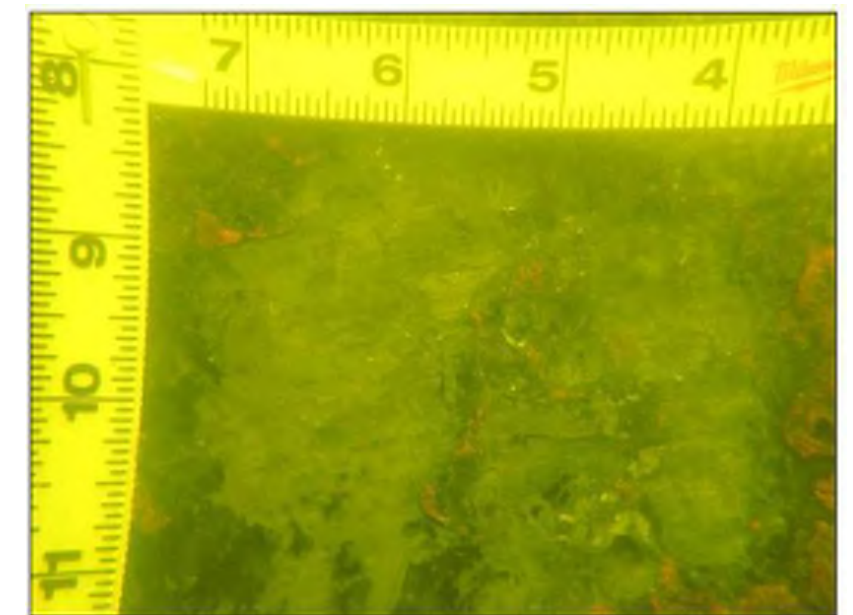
U.S. Coast Guard Dock and Pier Dolphins
